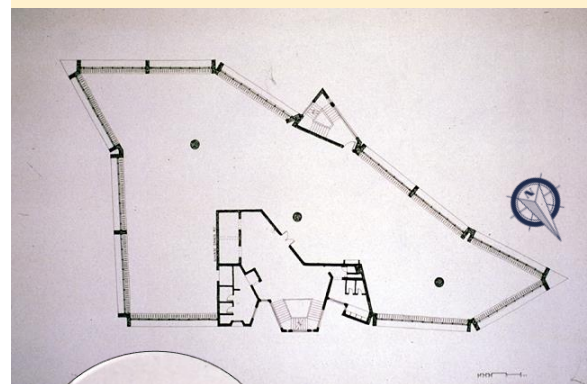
Typical Floor Plan of State Mortgage Bank Building (Source: Robson, D. (2002), Geoffrey Bawa)
